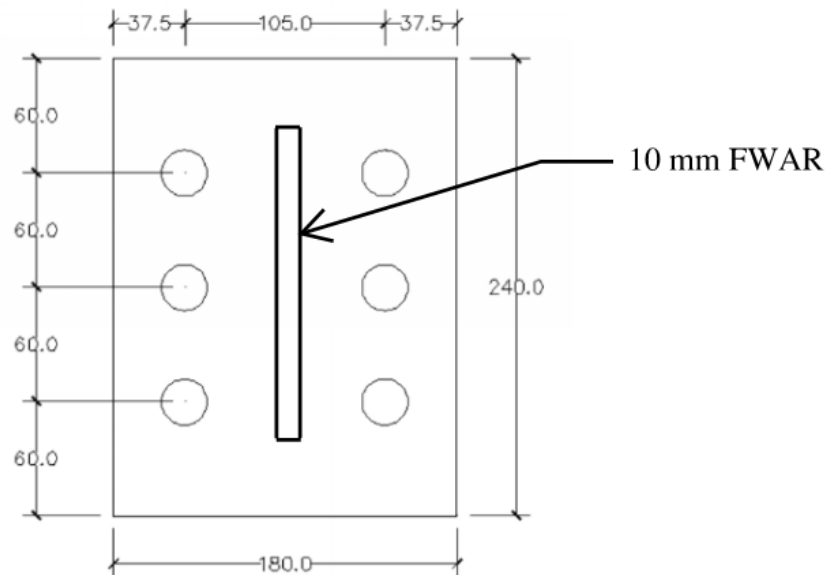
Non-yielding core weld to connection plate detail
